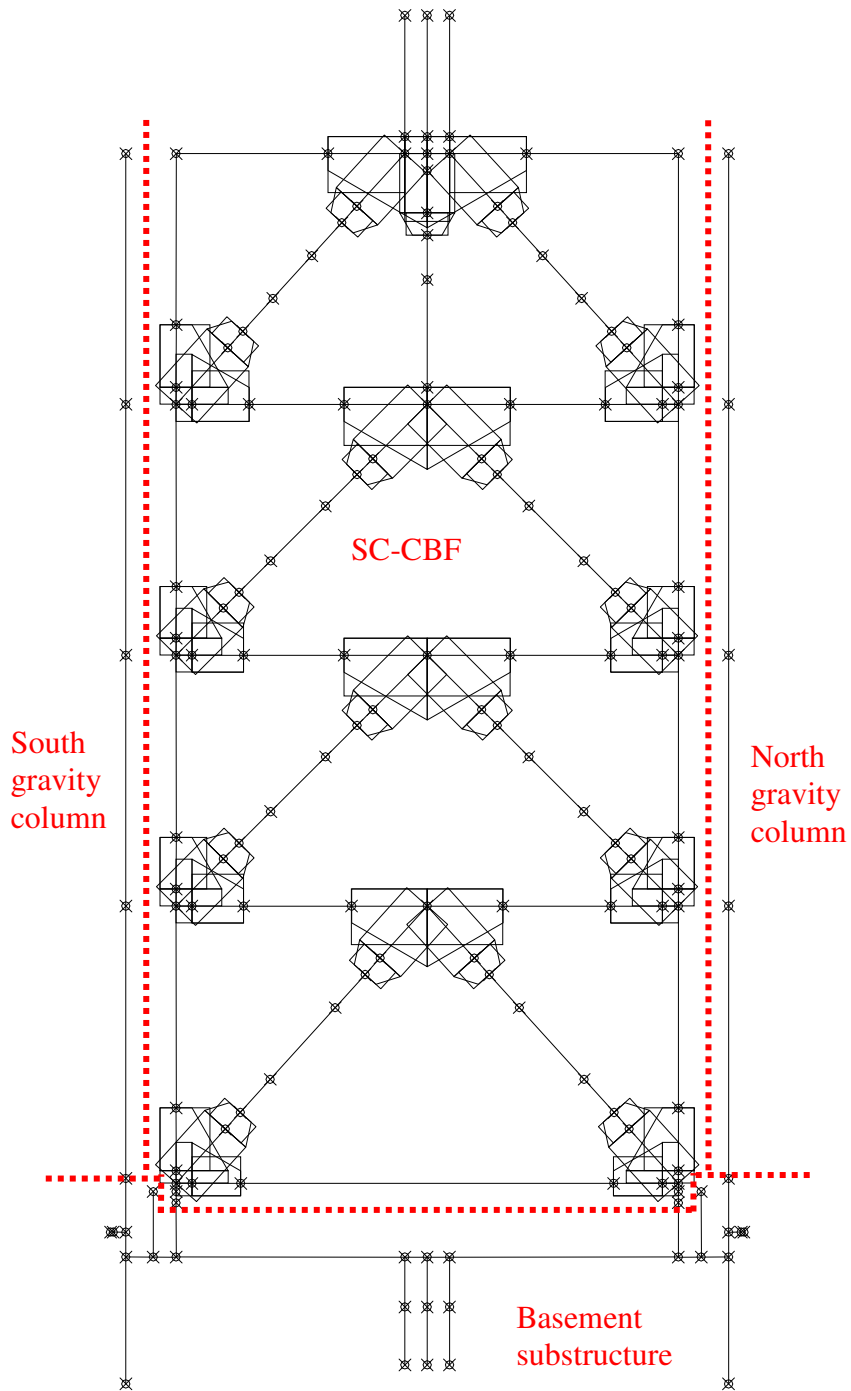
Schematic of analytical model of SC-CBF test structure, including basement substructure and adjacent gravity columns
